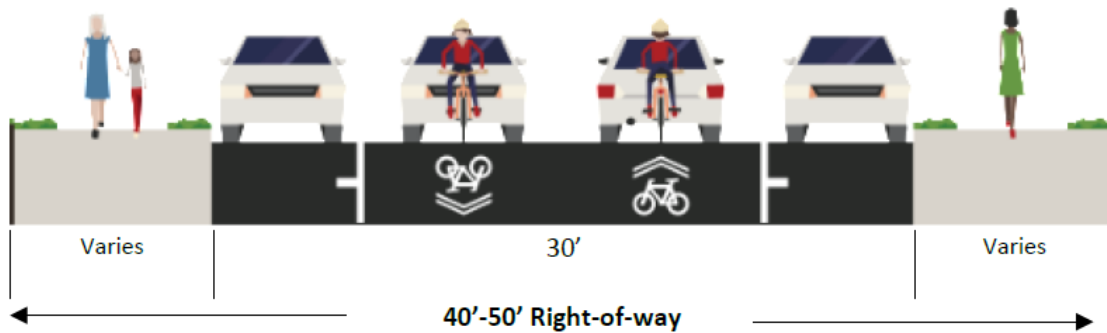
Bicycle Boulevard Cross Section – Roseburg TSP
